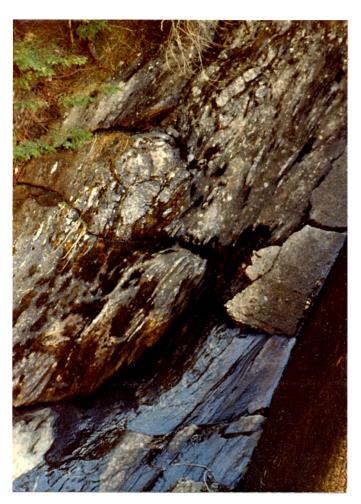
Close-up view of seepage shown in PHOTO NO. 5
